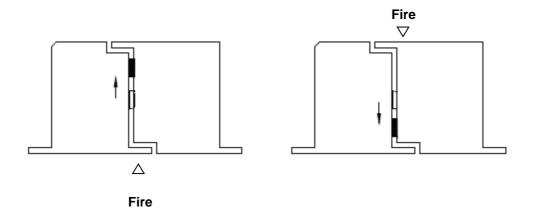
Intumescent seals between meeting edges of door leaves - Additional test for El-steeldoors with changed location
